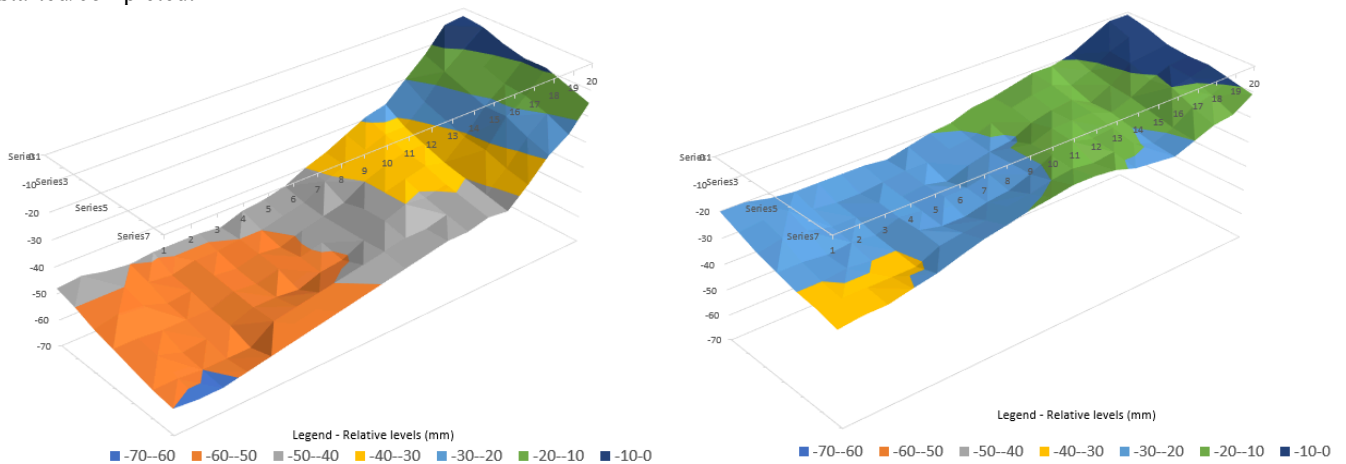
Floor slab profiles (a) before pile cutting, and (b) after pile cutting
